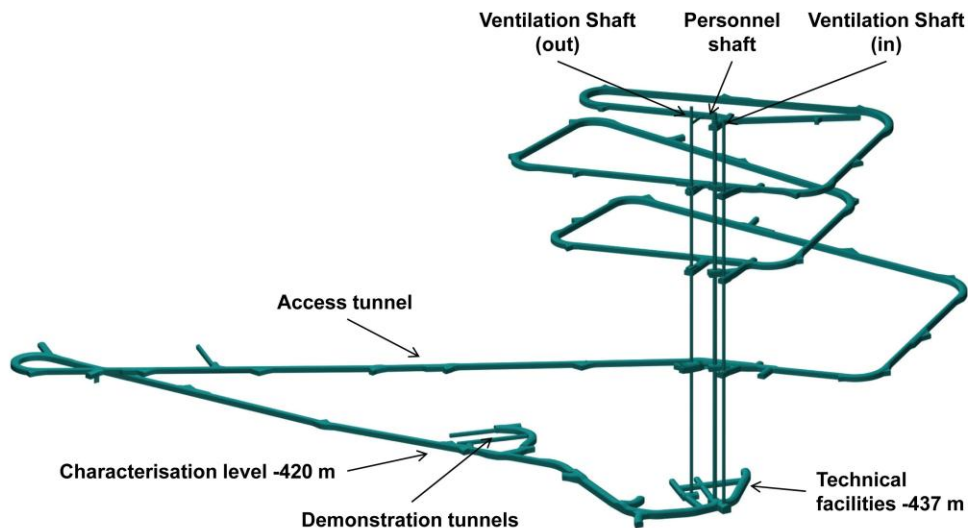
Overall layout of the facility for underground rock characterisation (ONKALO)
